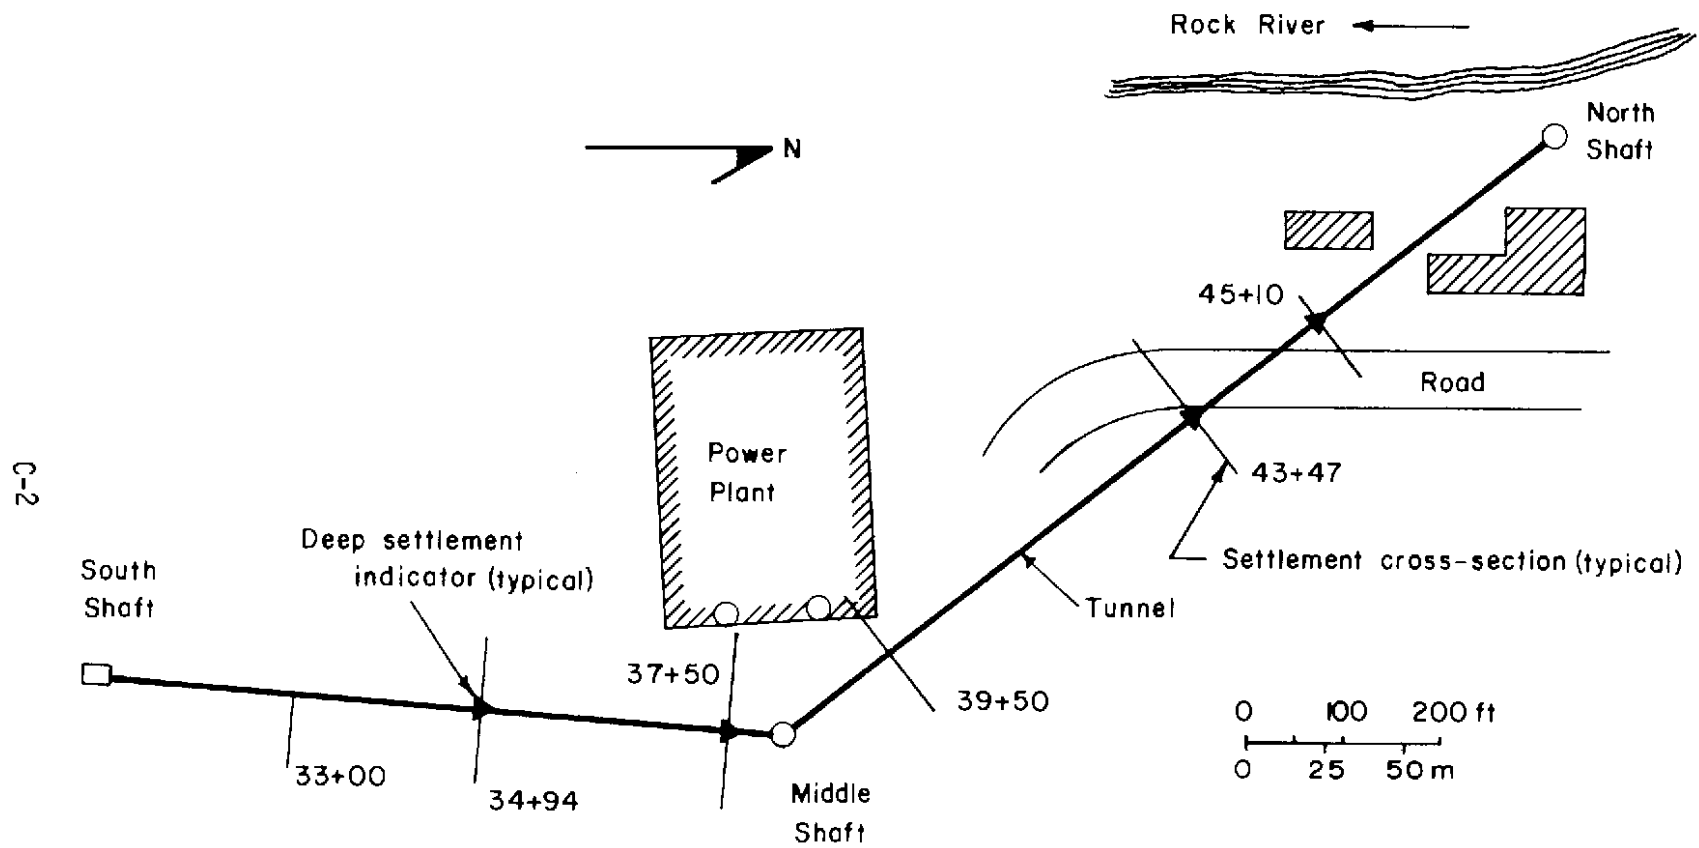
SITE PLAN - ELLIRP TUNNEL
